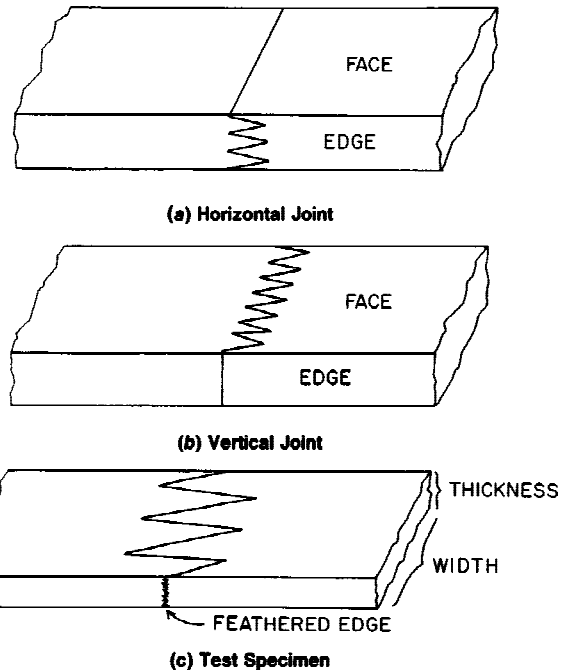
Finger Joint Assembly and Specimen Descriptions
